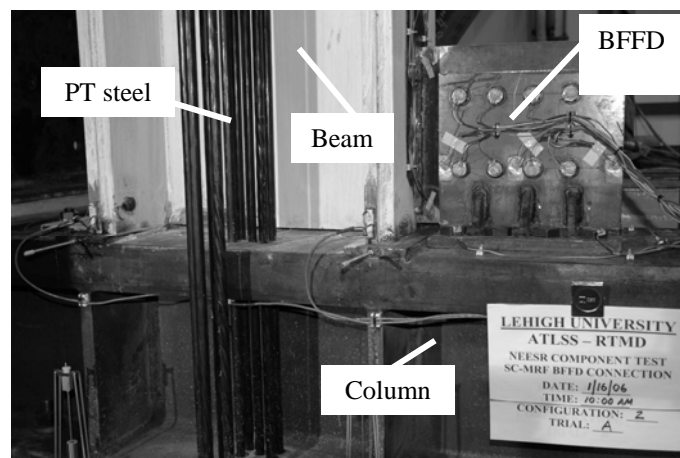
Photo of SC-MRF beam-column connection specimen with BFFD.
